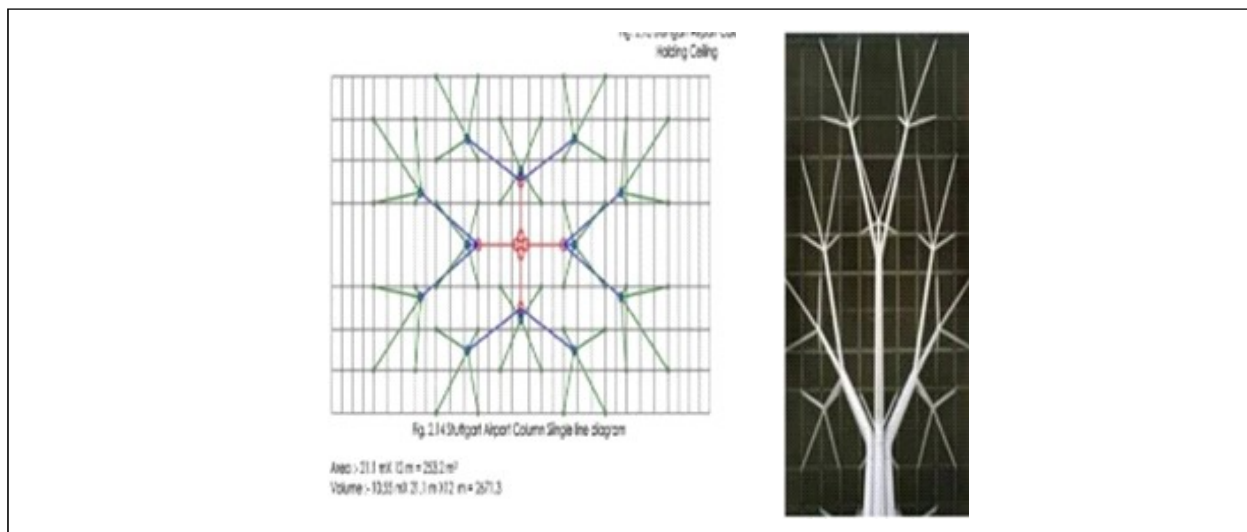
Stuttgart Airport (a) Column Single Line Drawing, (b) Column Holding Ceiling
